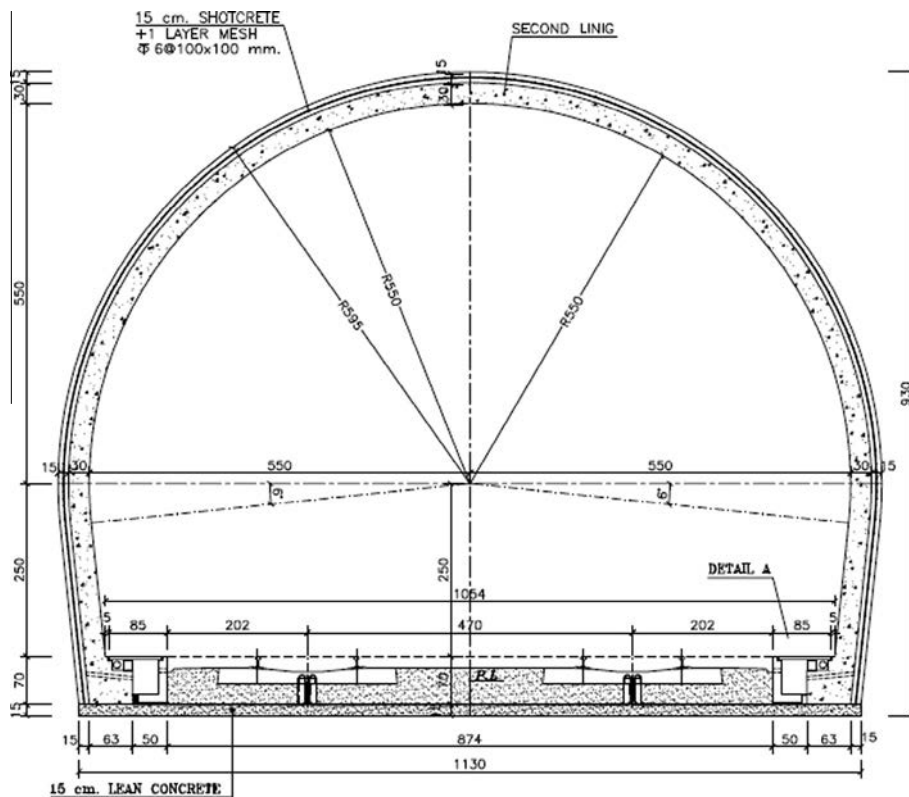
The Qazvin–Rasht railway tunnel cross-section.
